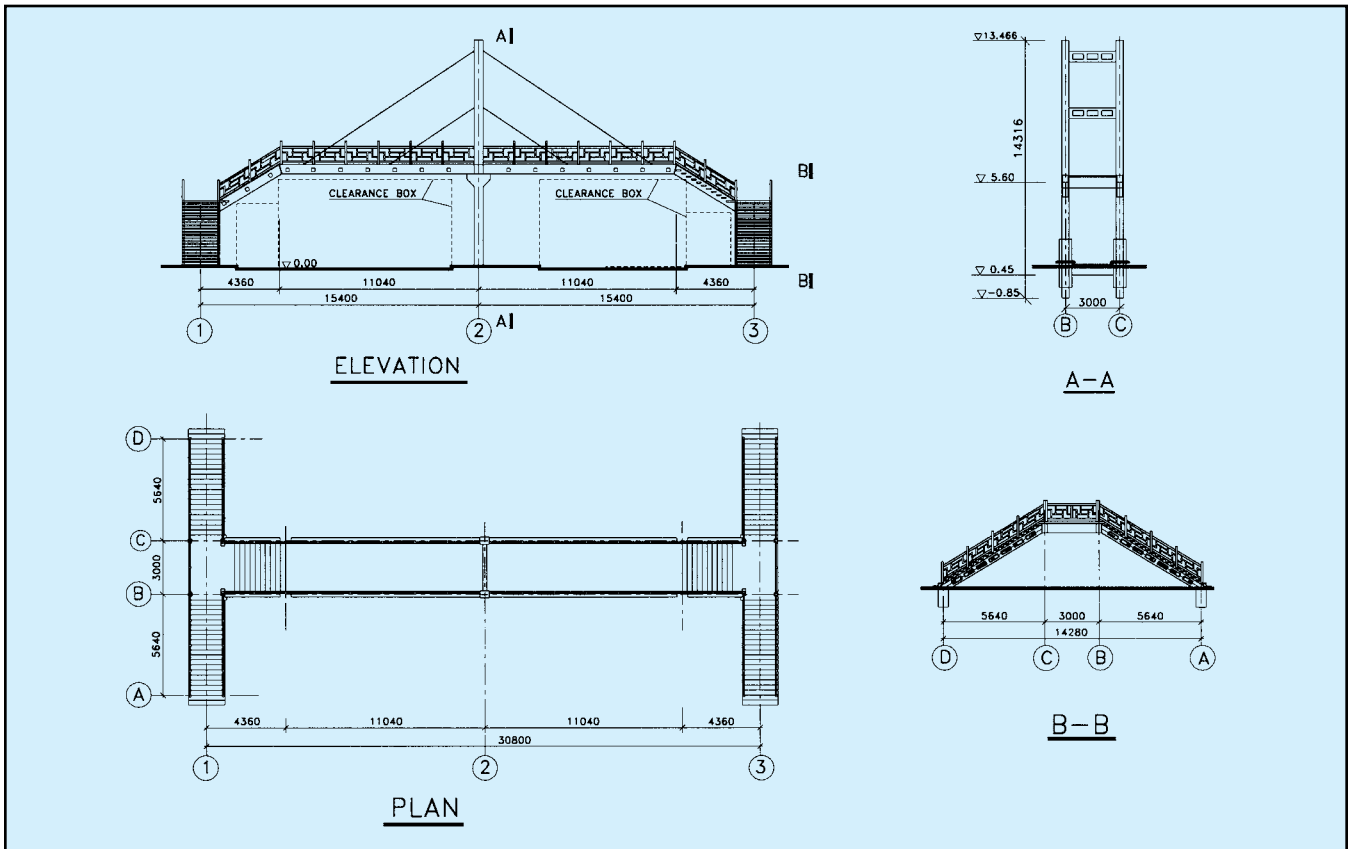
Plan, elevation and typical sections of cable-stayed bridge (Design Option B).
